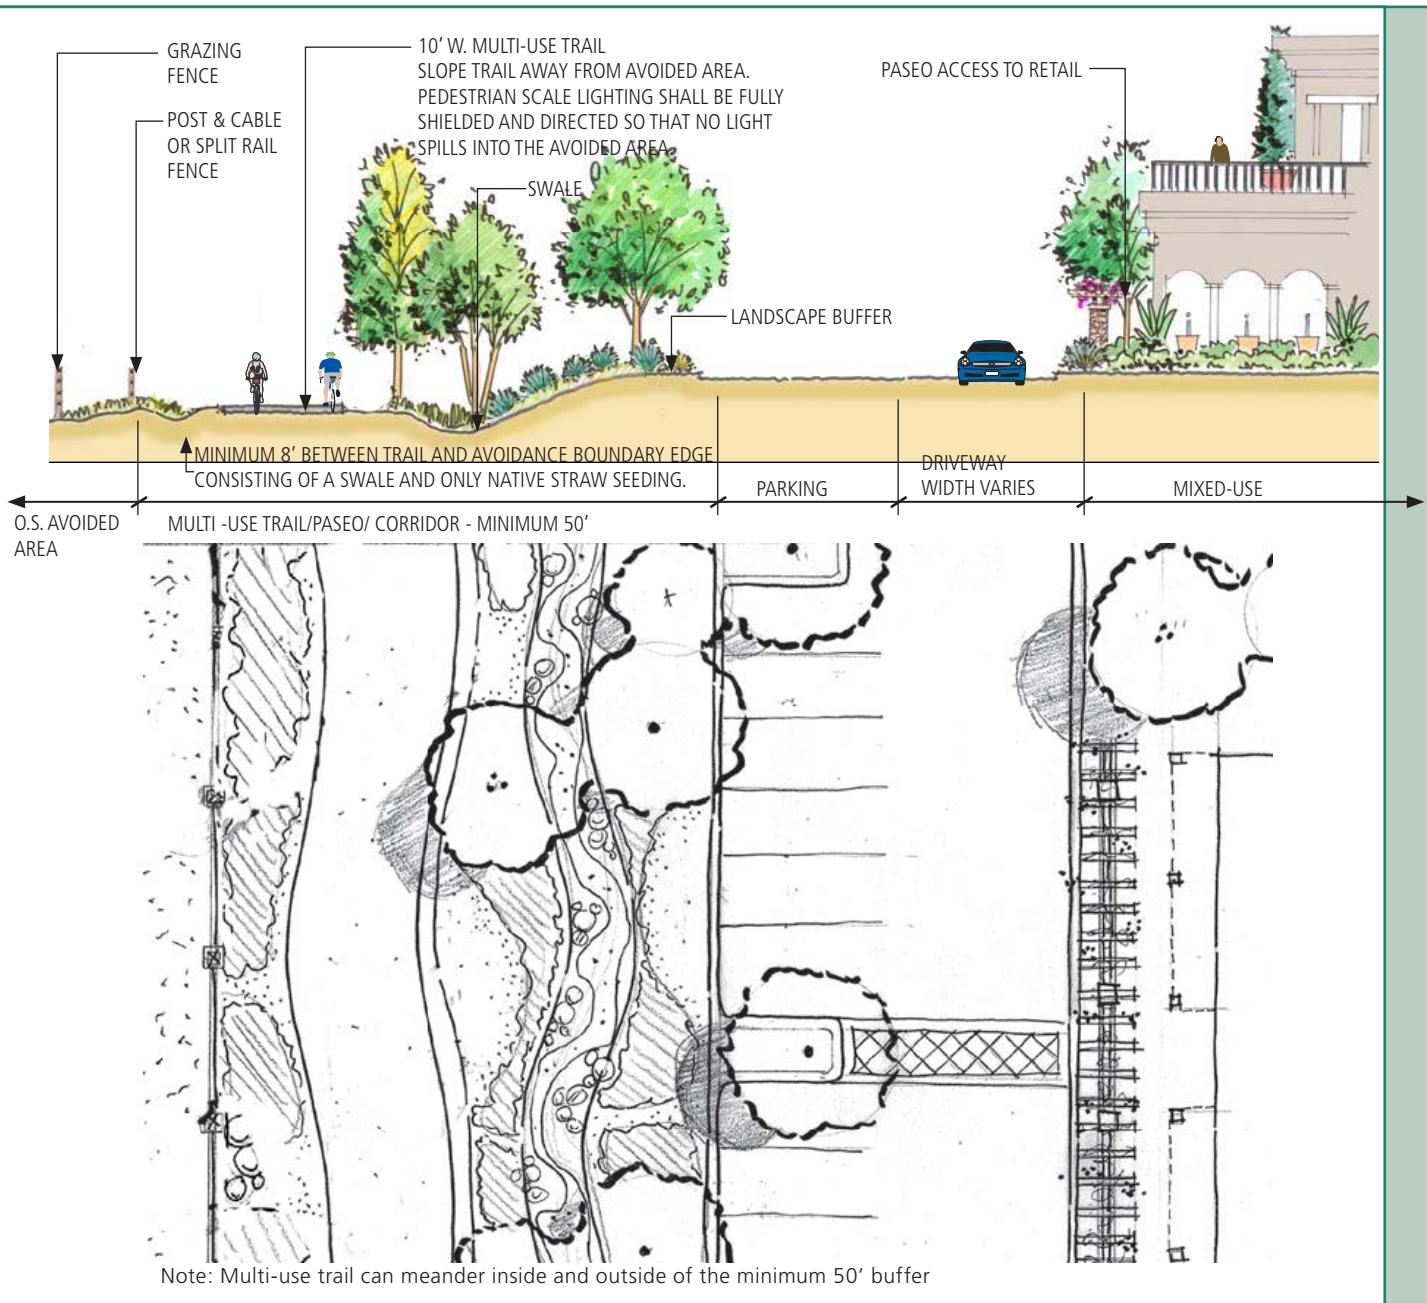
(b): Edge Condition 'B'-1 - Retail Mixed-use
